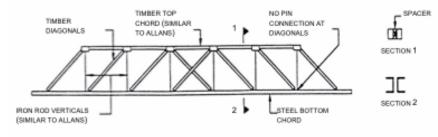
Schematic diagram of a Dare Truss (derived from DMR 1987)
